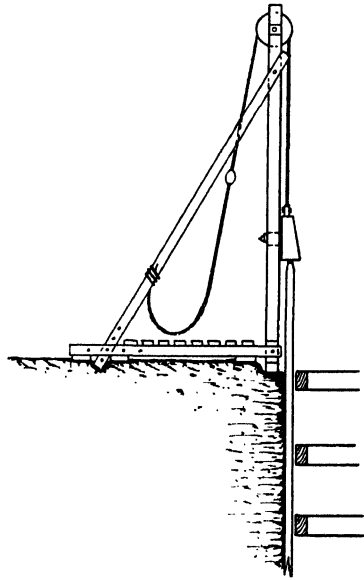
Hand Piling Engine for Runners, and Sheet Piles.
